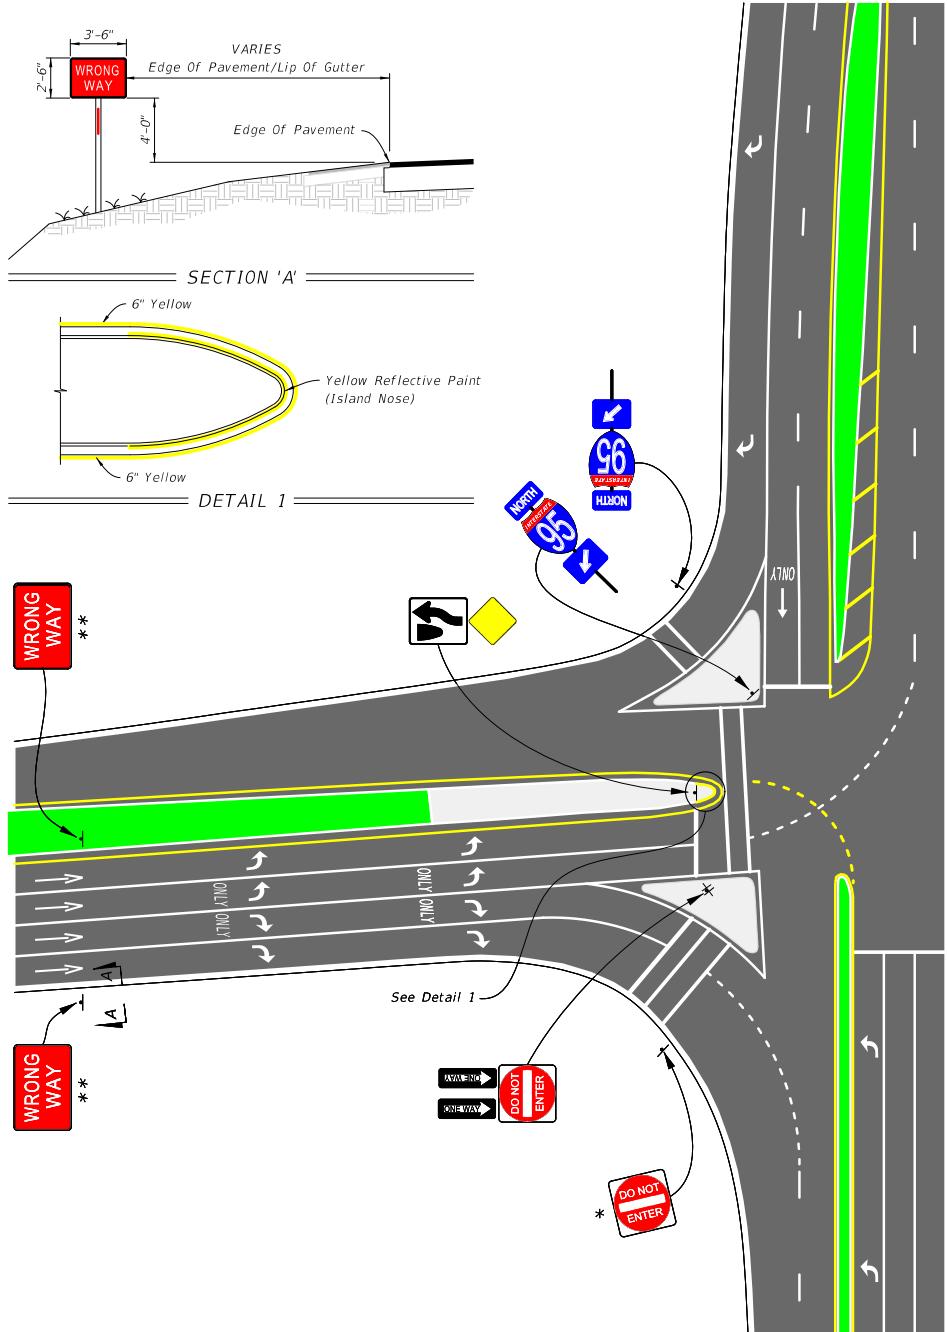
Typical Layout for Diamond Interchange Exit Ramp
